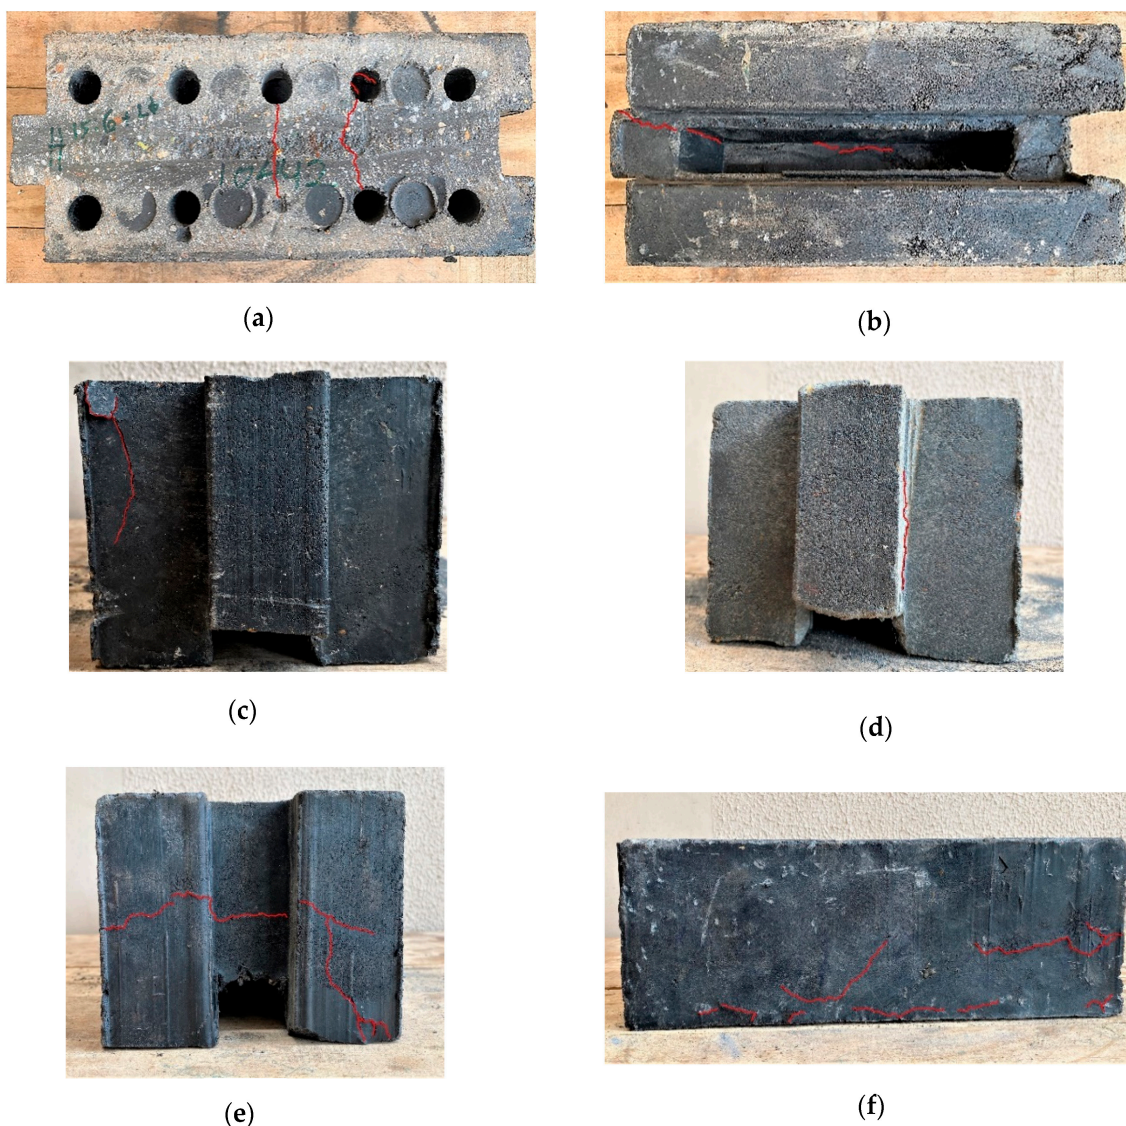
The development of cracks on the (a) top, (b) bottom, (c) side interlocking protrusions, (e) grooves, and (f) front side of the plastic-bonded sand interlocking block units under compression. (d) shows the splitting of the side protrusions from the main shell of the unit.
